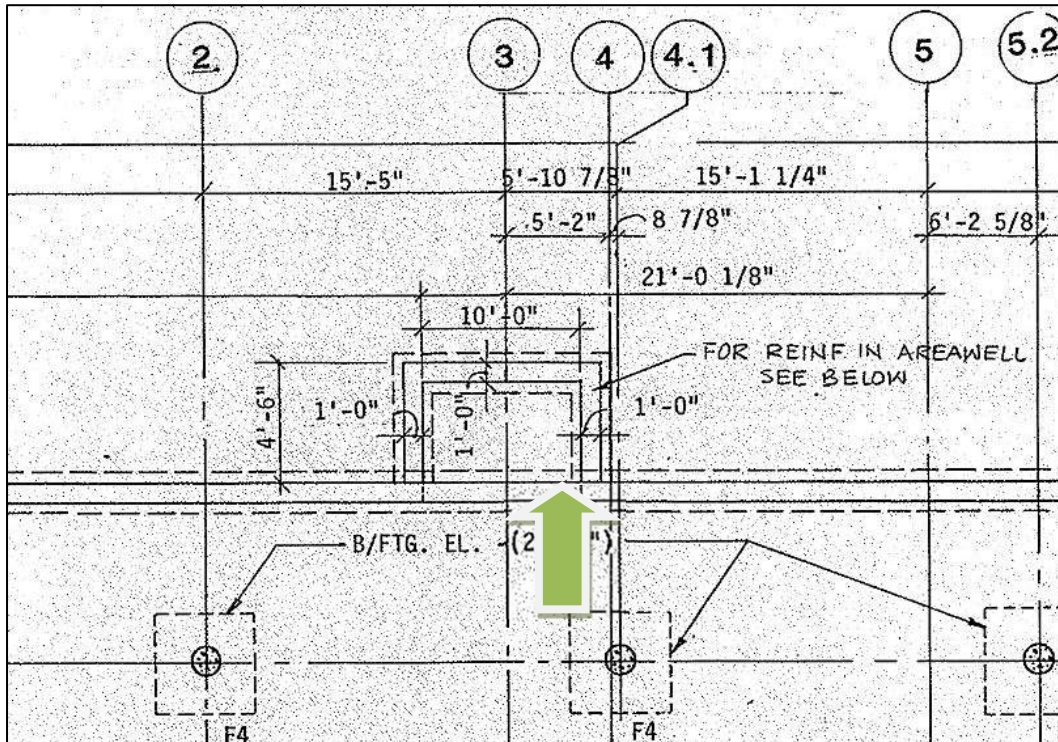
Area wells occur in the north and south foundation walls between grid lines 2 and 4.
